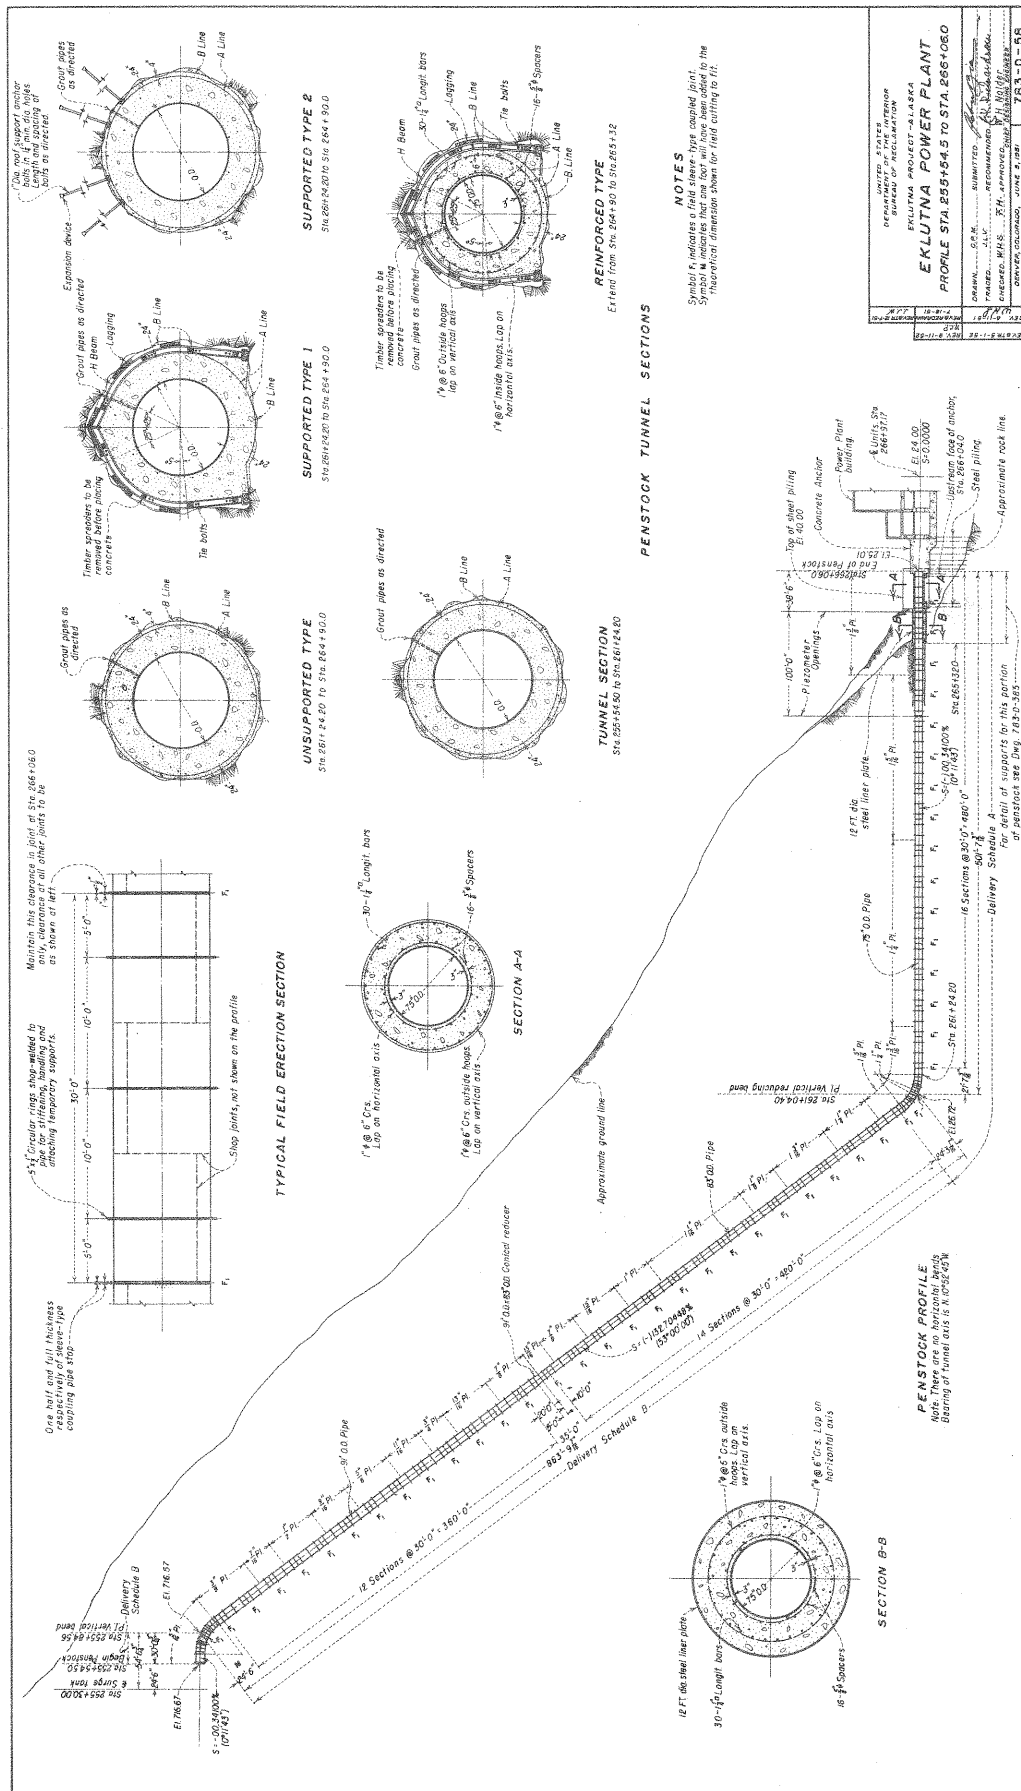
Penstock profile from station 255+45 to station 266+06.0.
